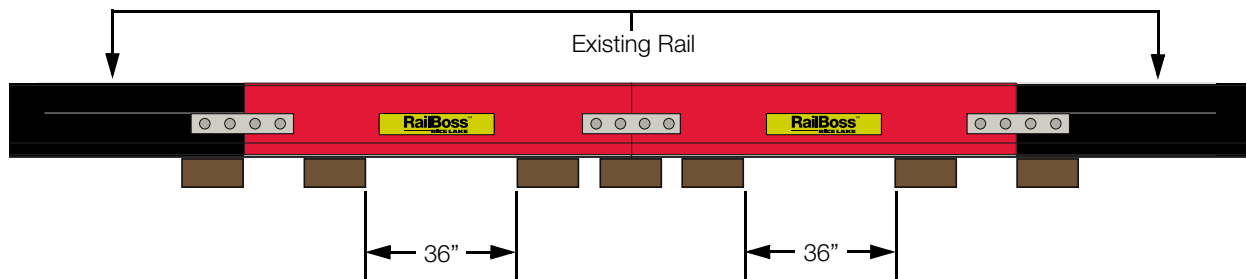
Tie Spacing in Relation to Existing Rail and Installed RailBoss
